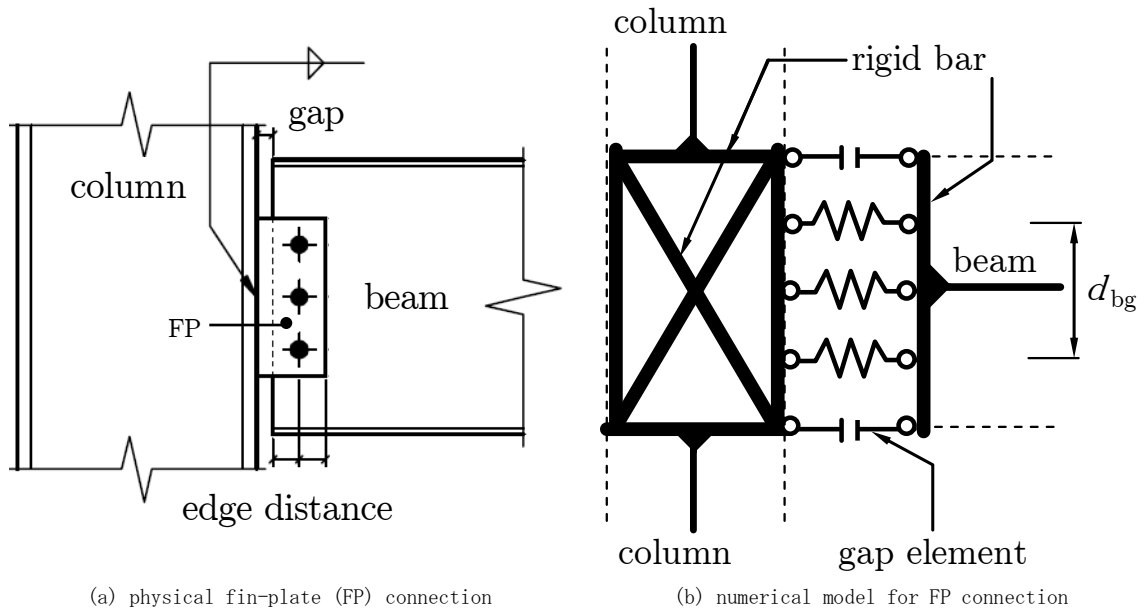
Component model for fin plate shear connection proposed by Sadek et al. (2008)
